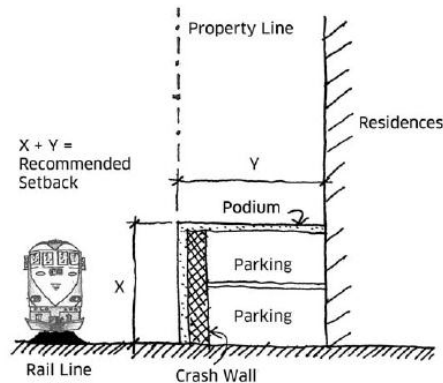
Deflection Wall Application (NOTE: Deflection walls should be located on the side of the podium facing the railway corridor) (Ref 23 and 47)
